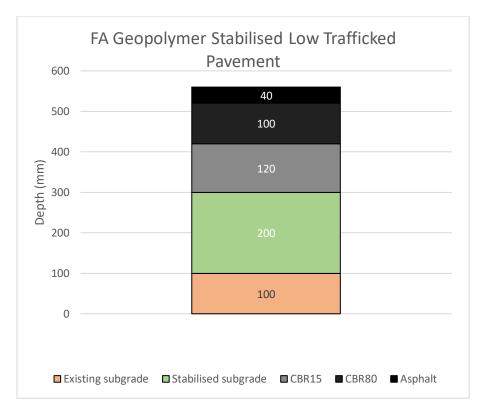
Fly ash geopolymer stabilised low traffic road (Author 2019)
